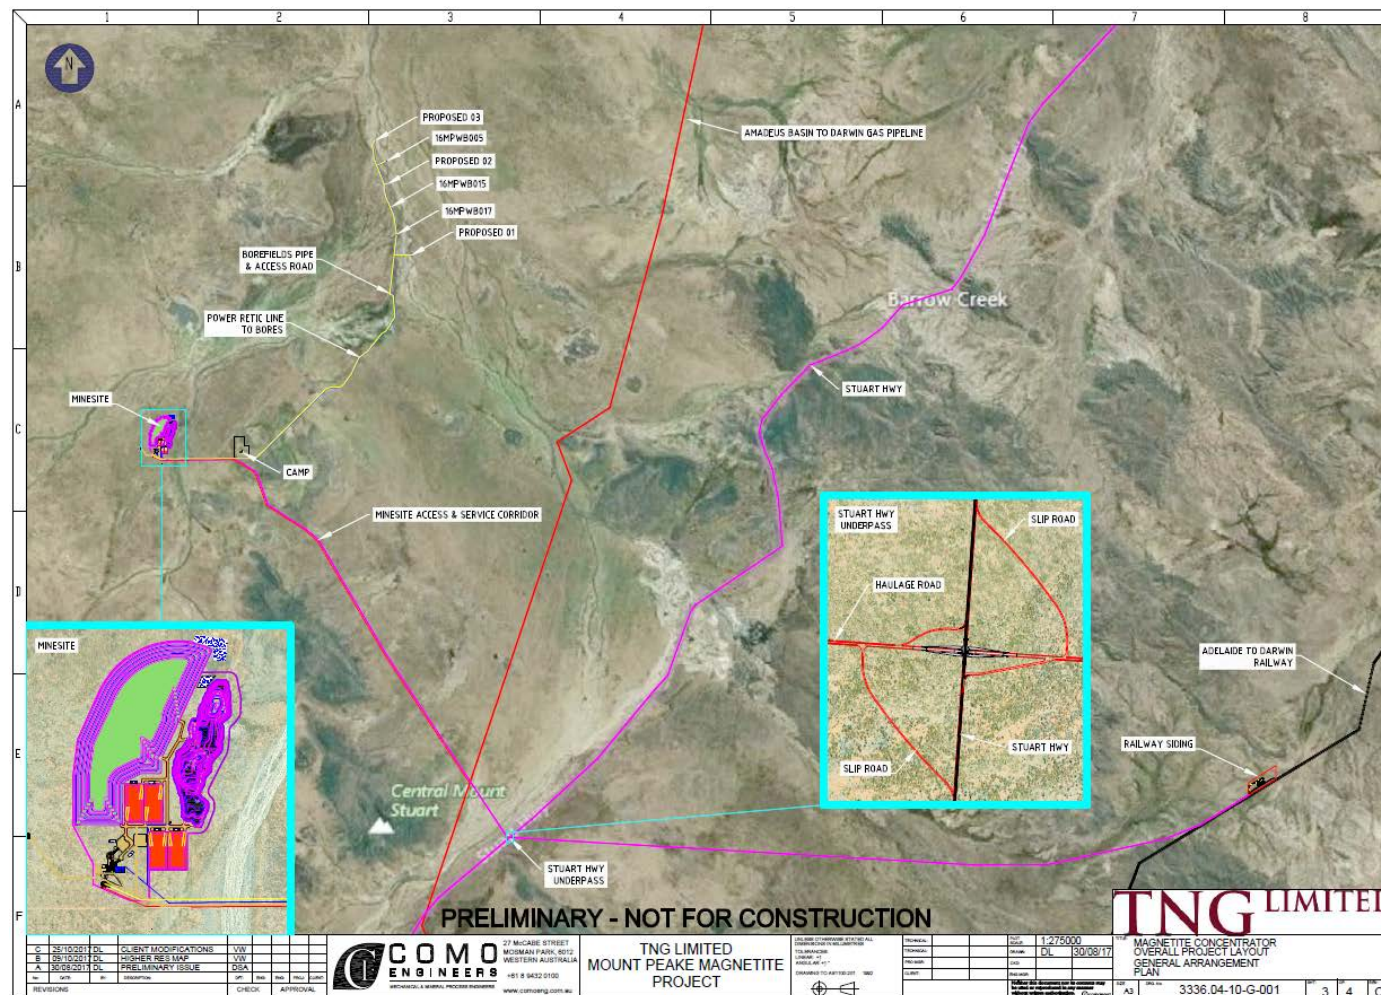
Mount Peake Project schematic layout including the mine site, the Stuart Highway Underpass and the Adnera Railway siding facilities. Source: Additional information.
